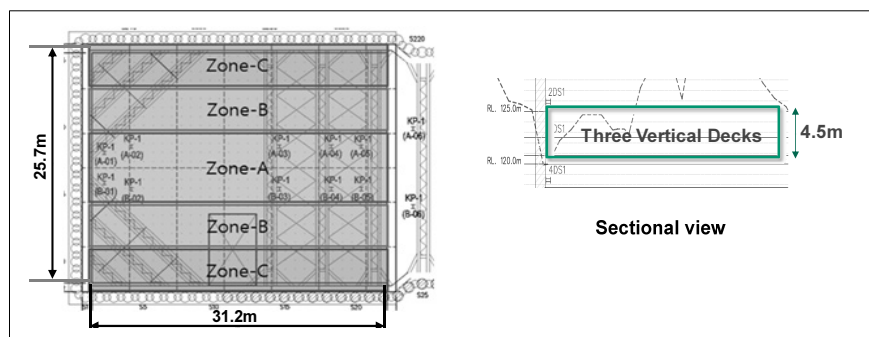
Layout of blasting area at the TBM launching shaft B in the revised blast design
